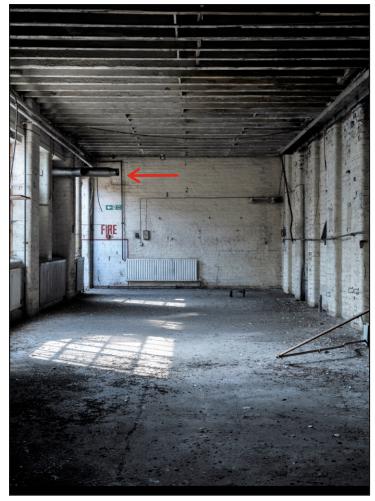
Internal view of Building 17 with a bearing housing wall box within the southern wall (arrow)
